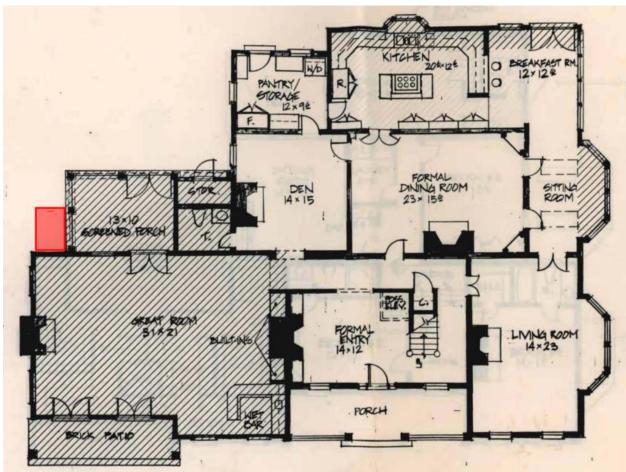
Plan of addition constructed in 1987, approximate area of new work shown in red box
